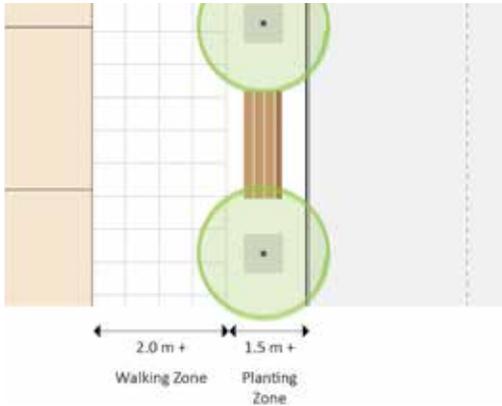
TECUMSEH ROAD MAIN STREET RIGHT-OF-WAY SECTION
